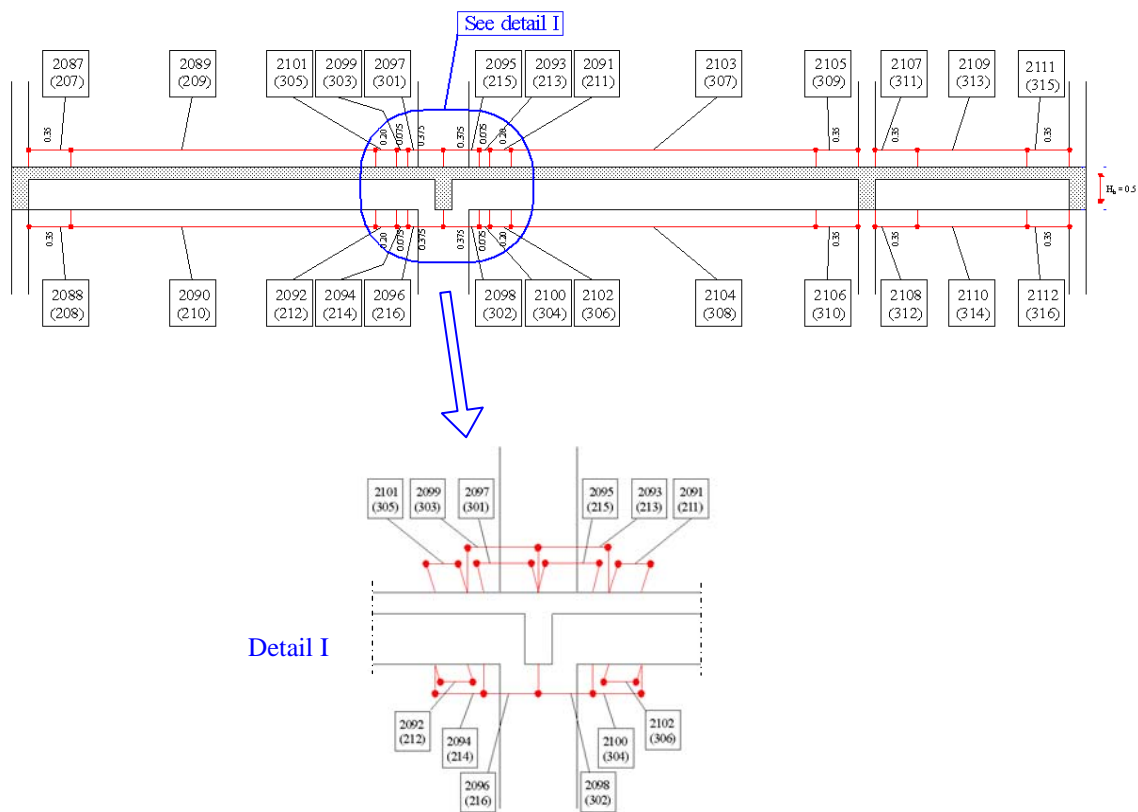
1<sup>st</sup> floor beam instrumentation: general layout, dimensions and detail of the zone nearest to the strong-column
